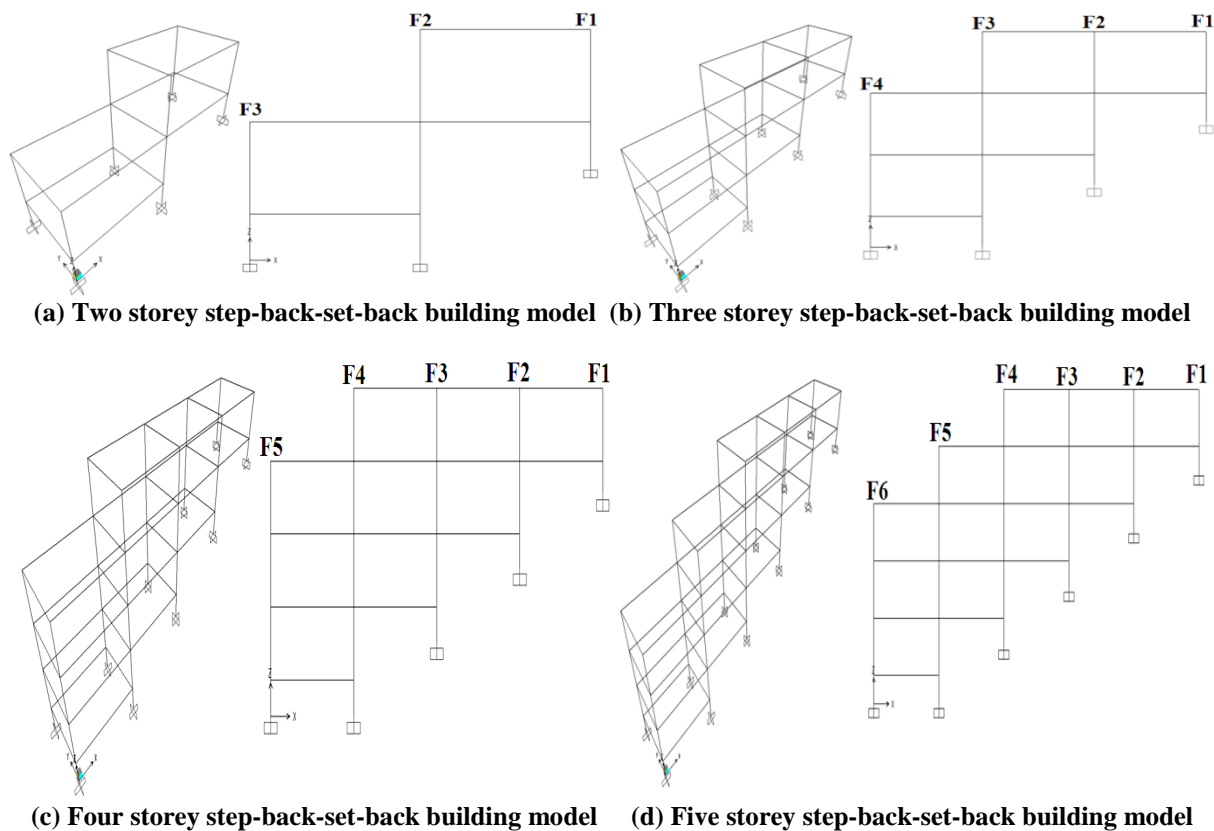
Step-Back-Set-Back (SBSB) building models
